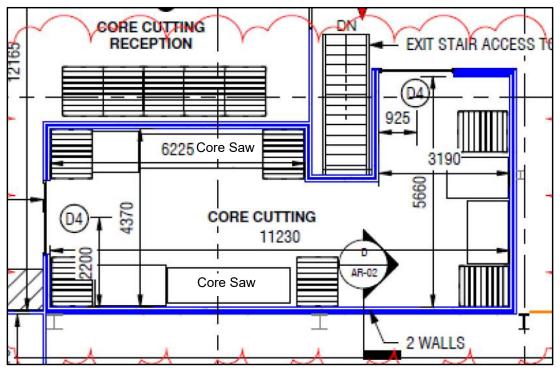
Drill Core Cutting Room Arrangement (after Jamie Tersago)
